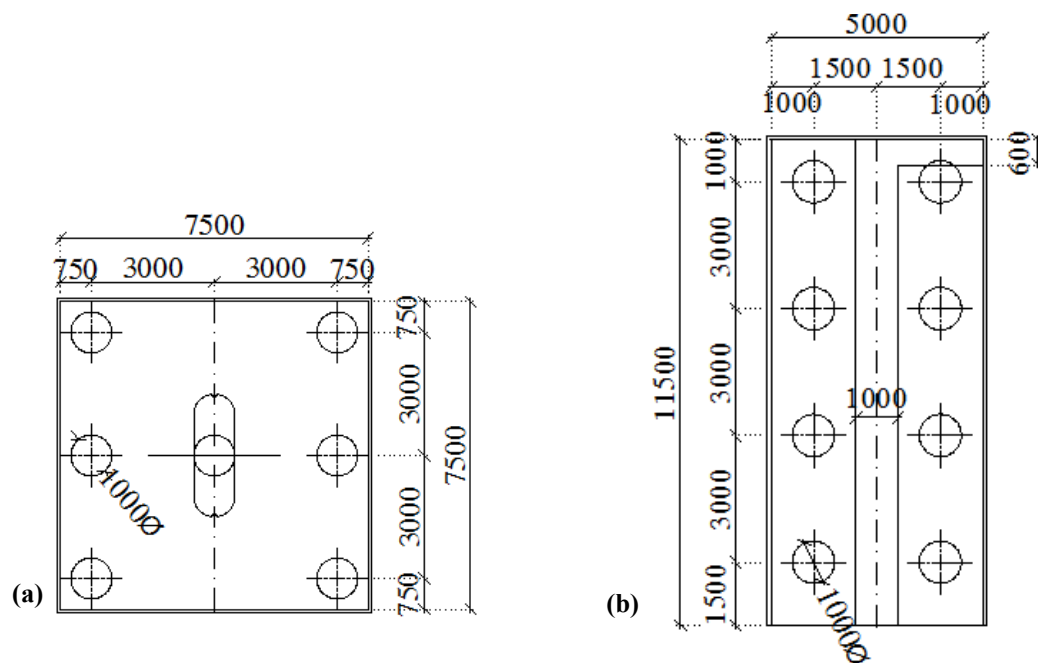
Boundary conditions for (a) Column foundation and (b) Abutment foundation
